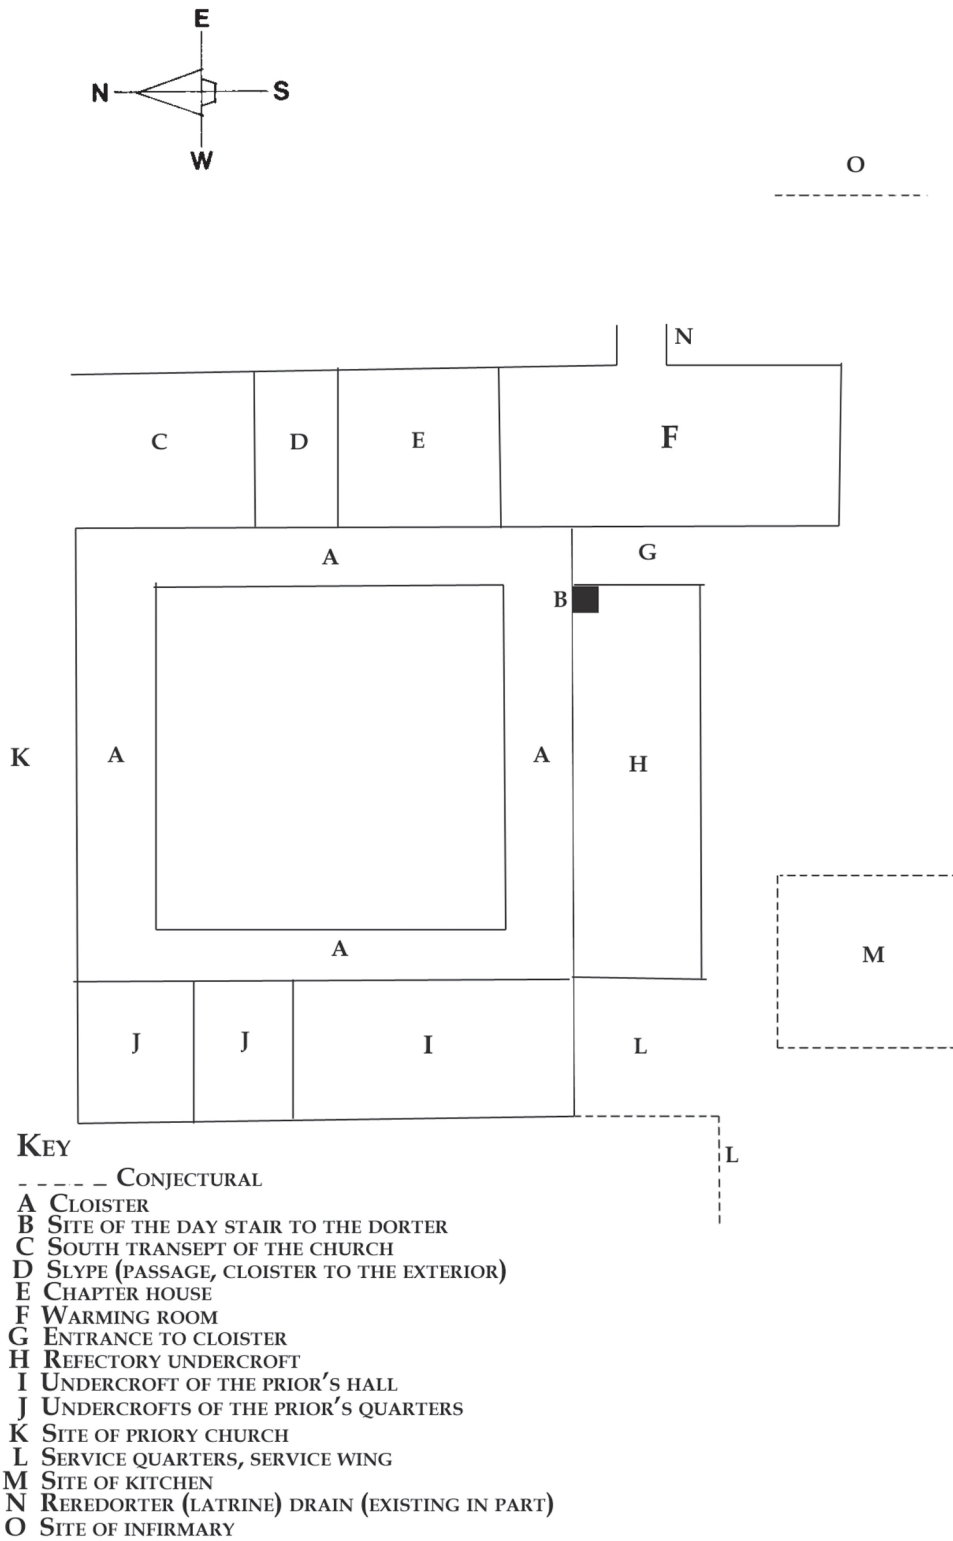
Newstead Priory: Diagrammatic plan of the claustral buildings before the Dissolution: ground floor.
